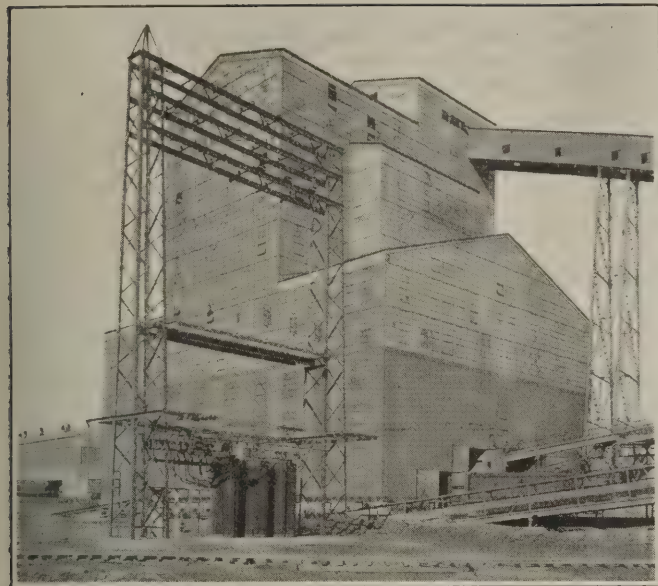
Storrs Breaker, Glen Alden Coal Co.
